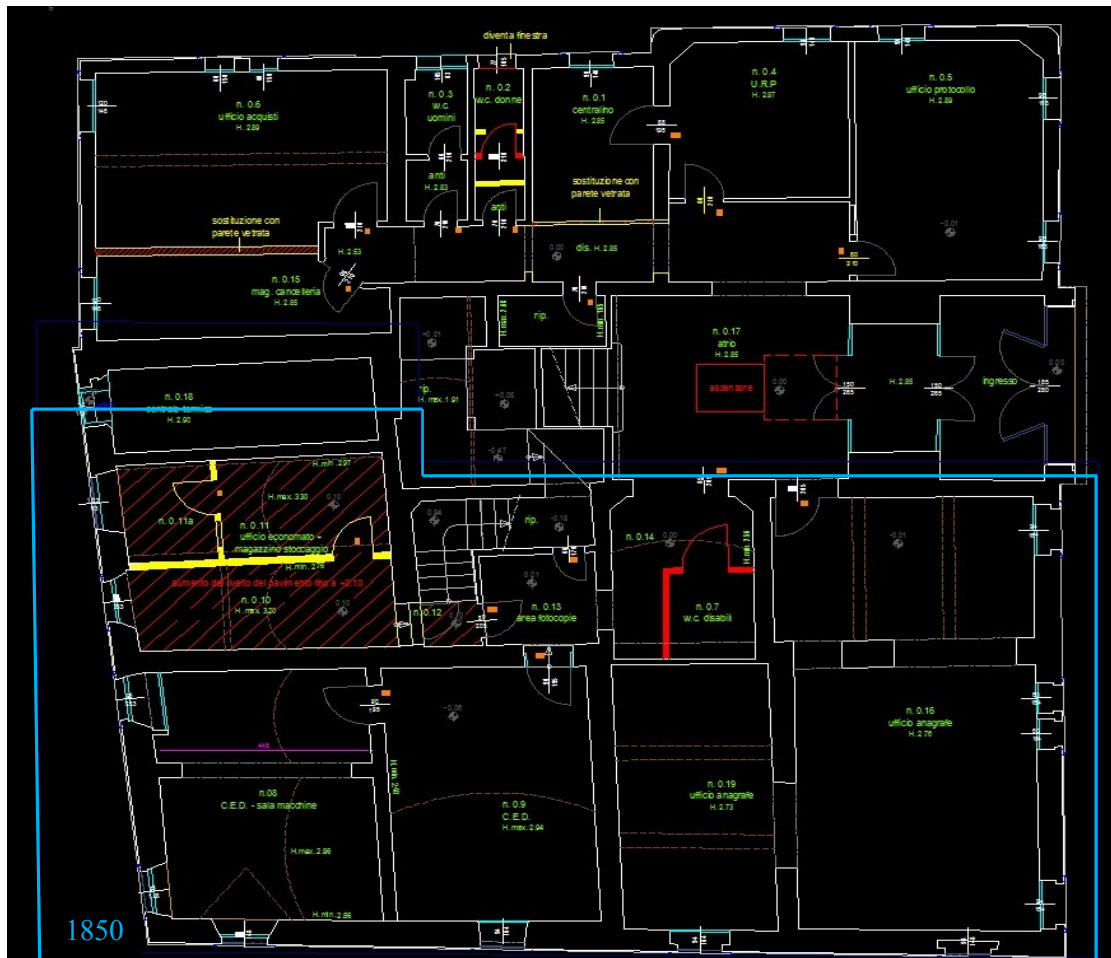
Ground floor plant of Fiorano Modenese's Town hall
